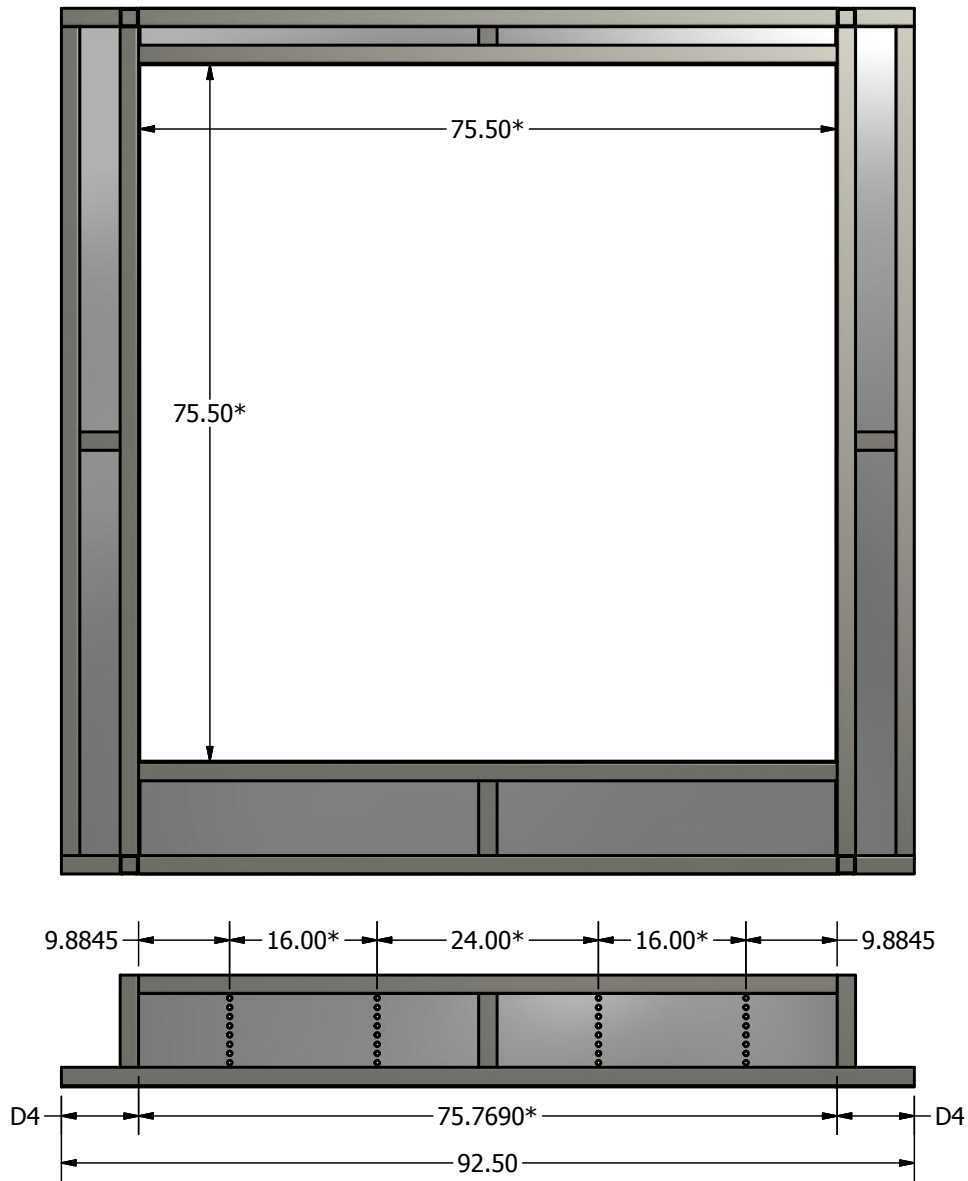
Profile and top views of the wall frame (refer to Appendix A for details).
